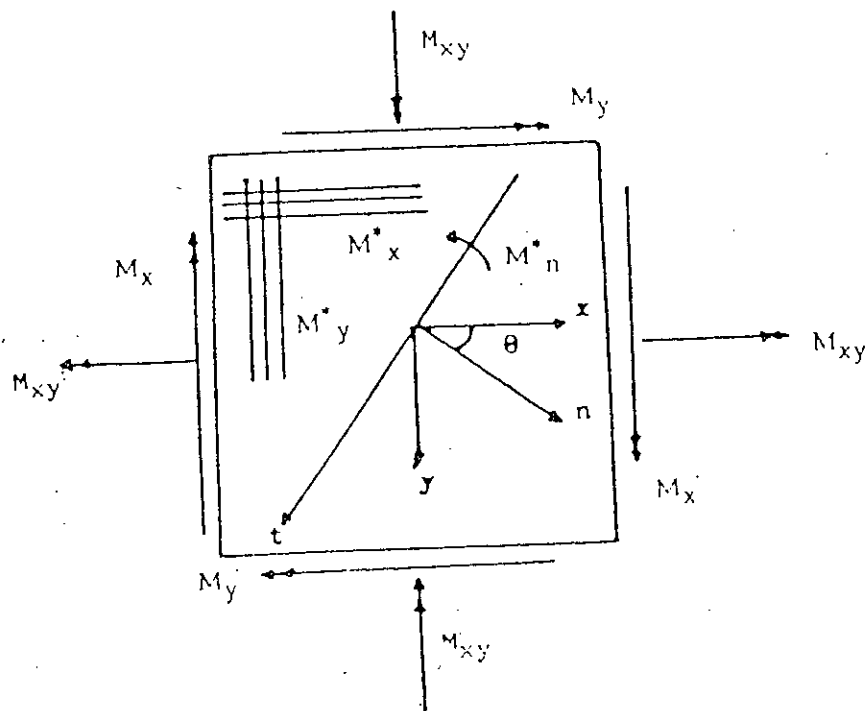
A typical slab element with orthogonal reinforcement.
